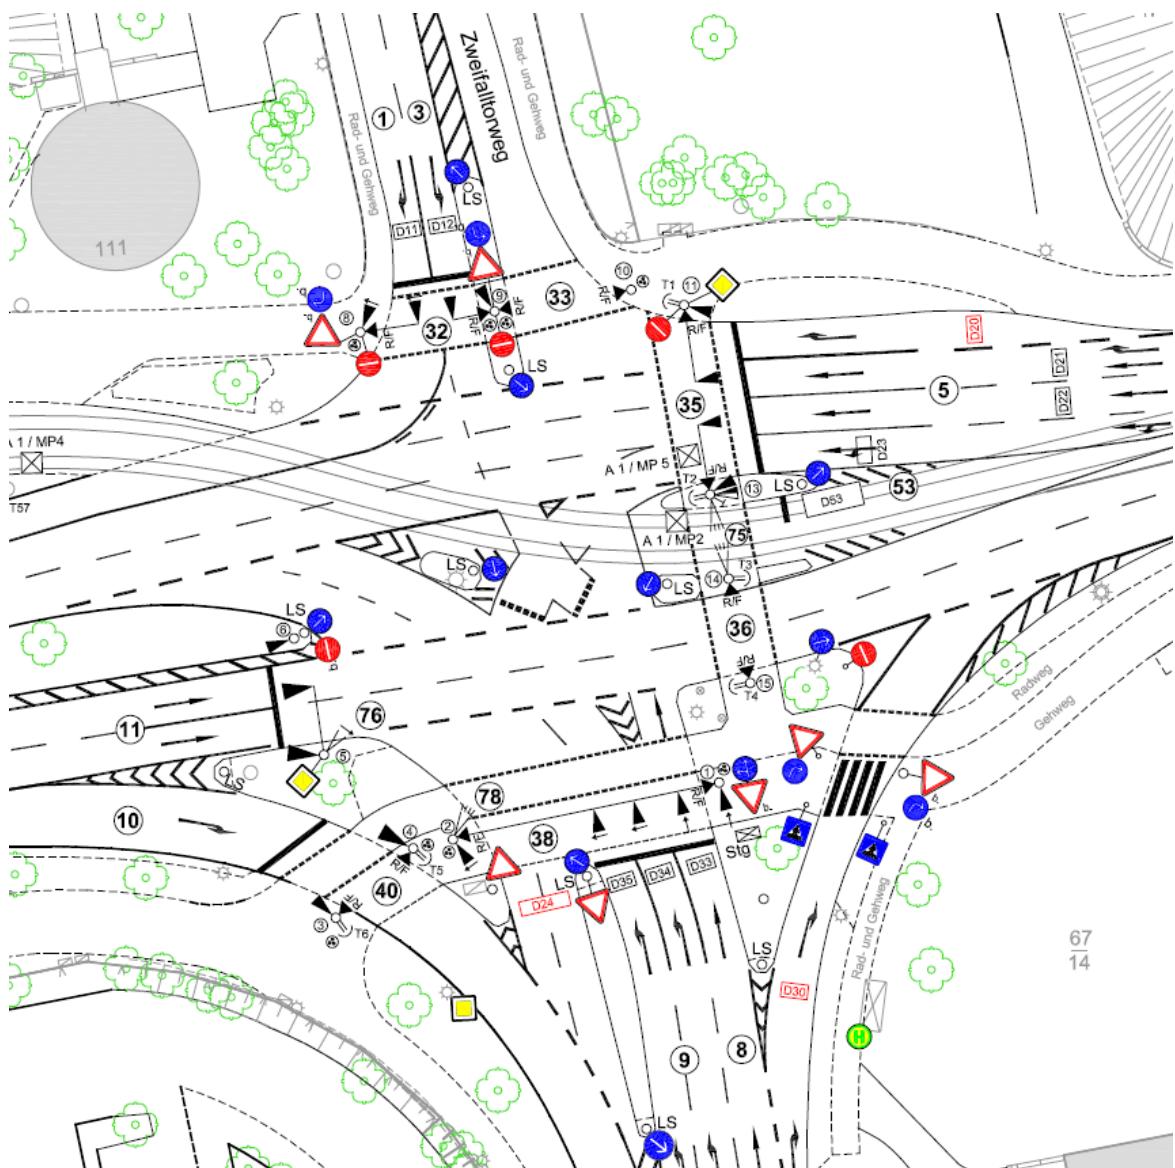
Junction layout of A1 intersection, Darmstadt (Source: Darmstadt Town hall)
